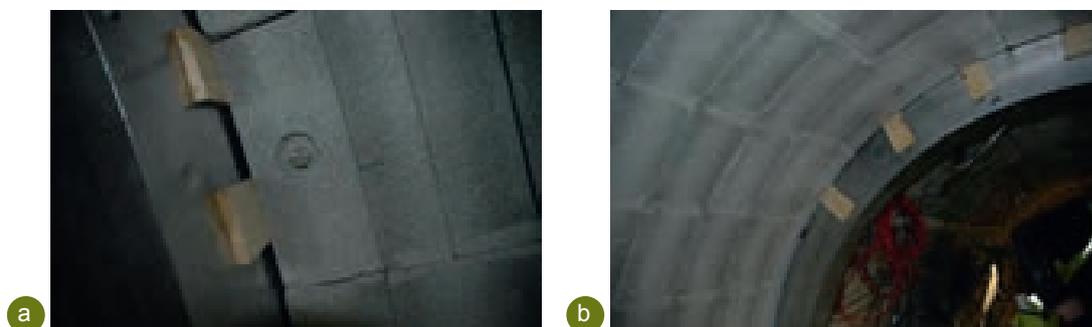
Wooden wedges were placed between the inner ring 2g and the downstream flange as an extra support for the inner rings.
